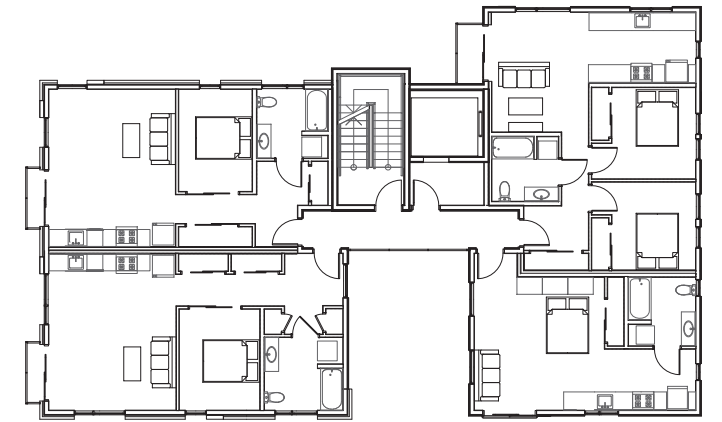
Partial floor plans for 614 13th Ave E ("614 13th Ave E Apartment Building, Seattle, WA 98102" 2023).
